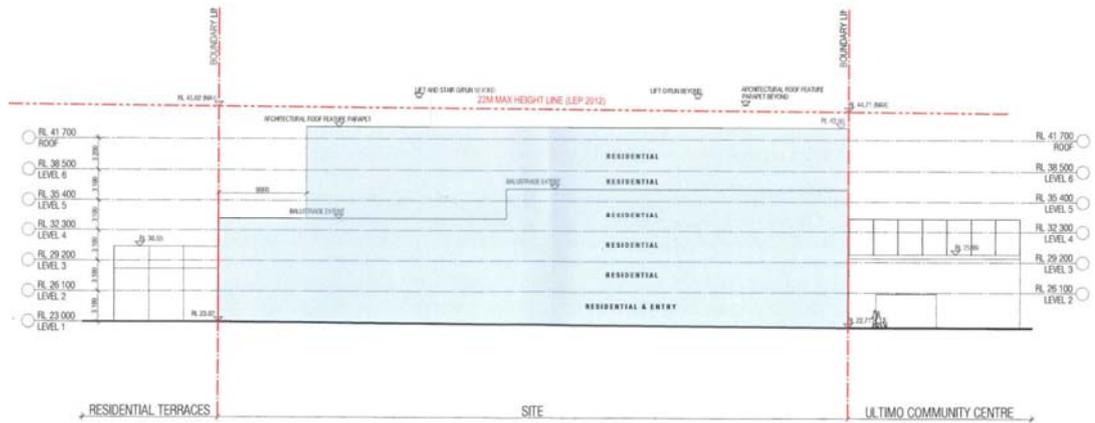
Western (Bulwara Road) Elevation of Stage 1 concept approval
